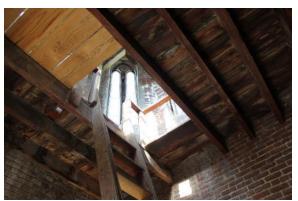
, Historic Courthouse, Bell Tower, Room 302, view of the ceiling at the second story, looking up through the access hatch to the third story.
